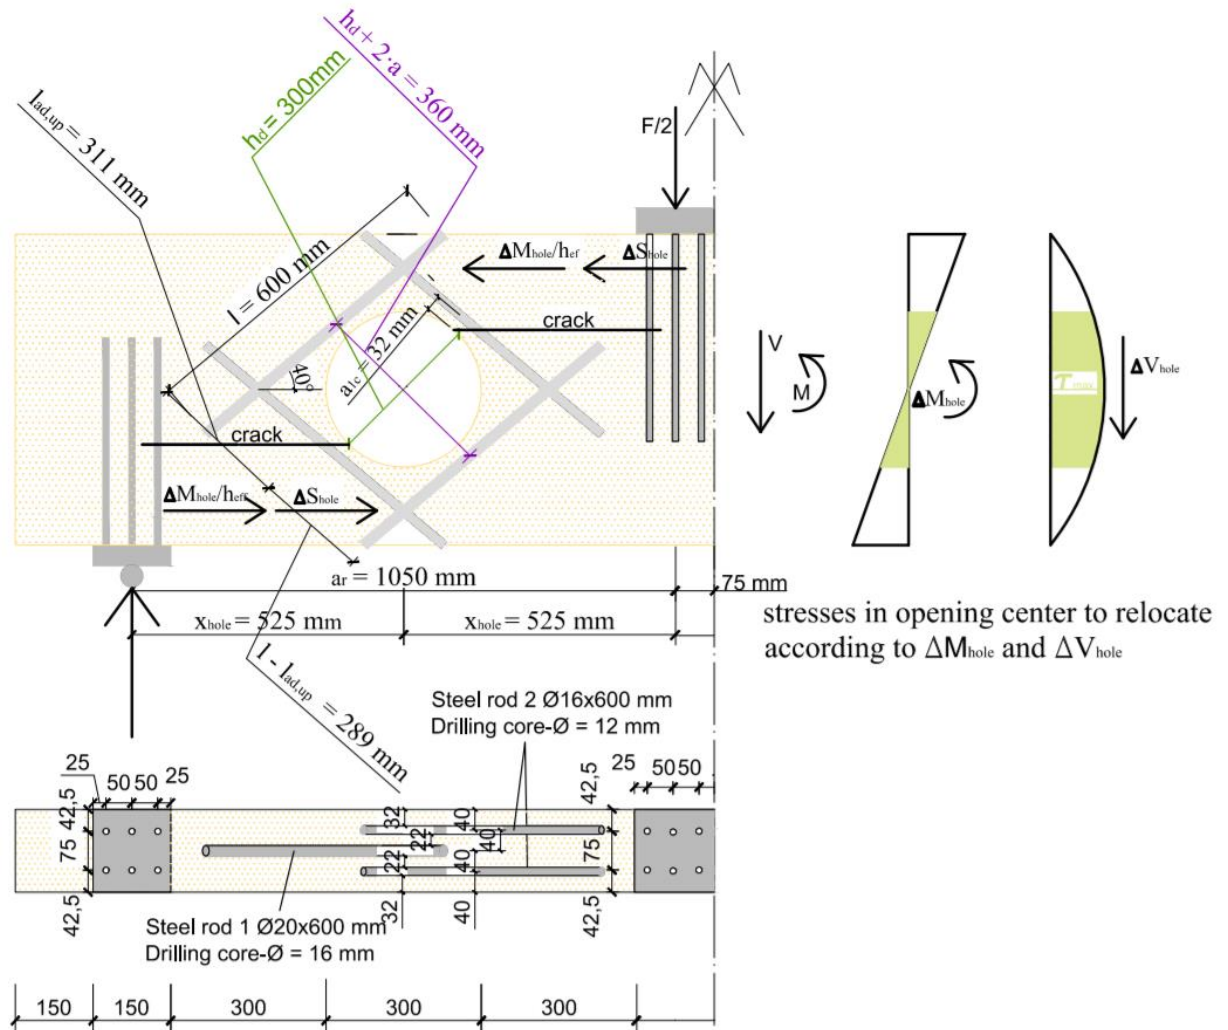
Outline and dimensions of the GLT beam with inclined screwed-in / glued-in threaded rods under an angle of 40° of series G and H [28] (adapted)
